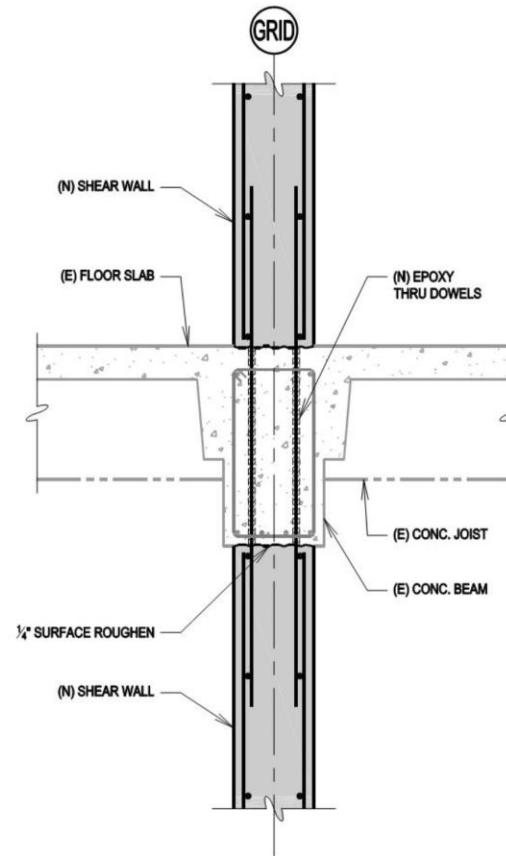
Example Detail of Shear Wall/Beam Dowel Connection
